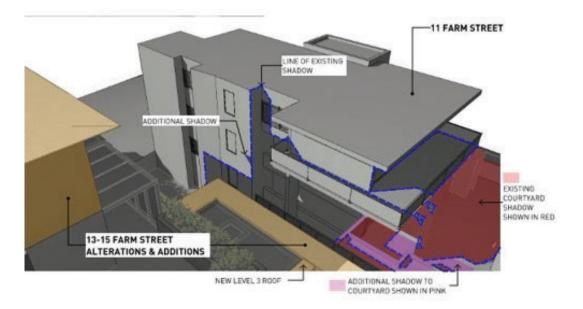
Additional overshadowing onto 11 Farm Street at 1pm.
